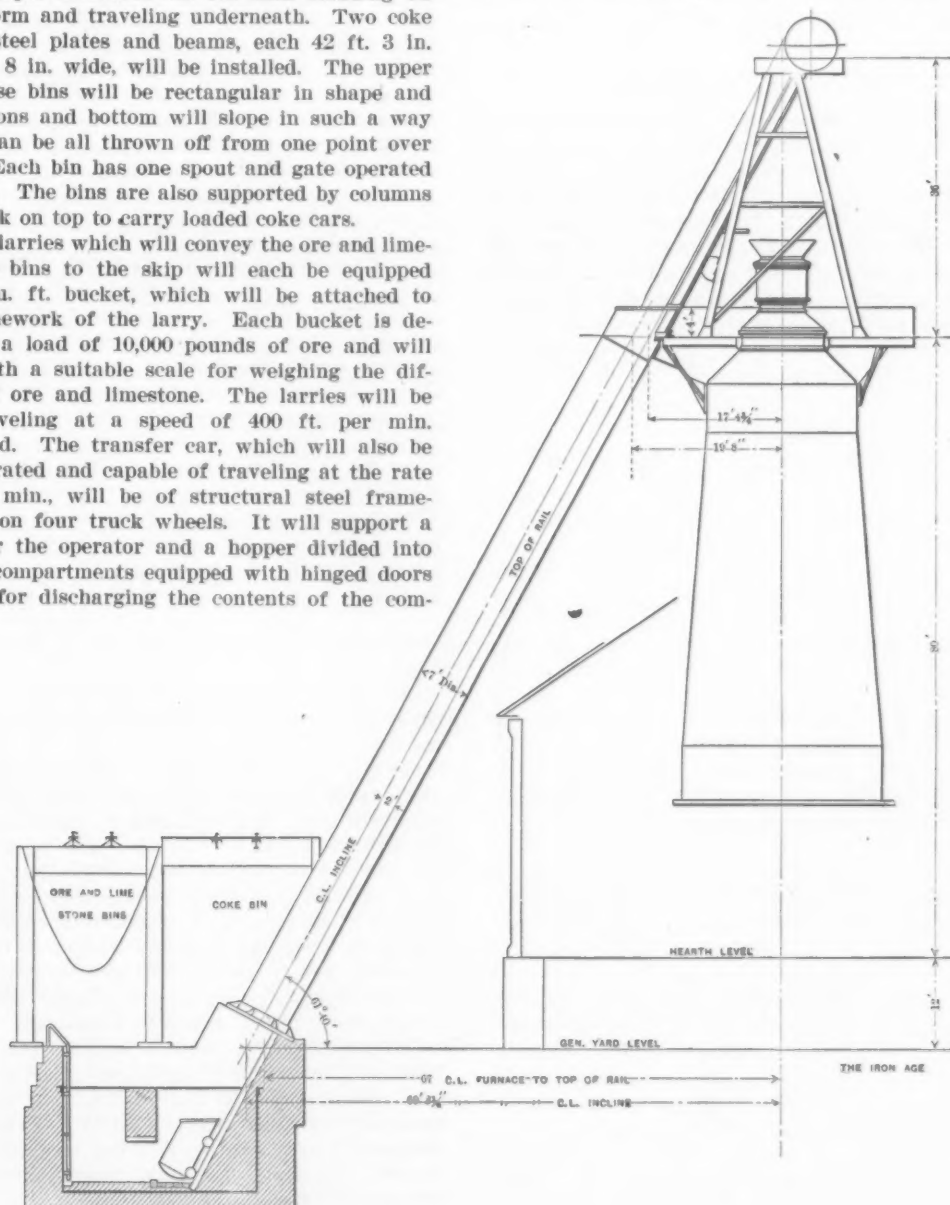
Side Elevation of Furnace Top, Skip Incline and Bins.
